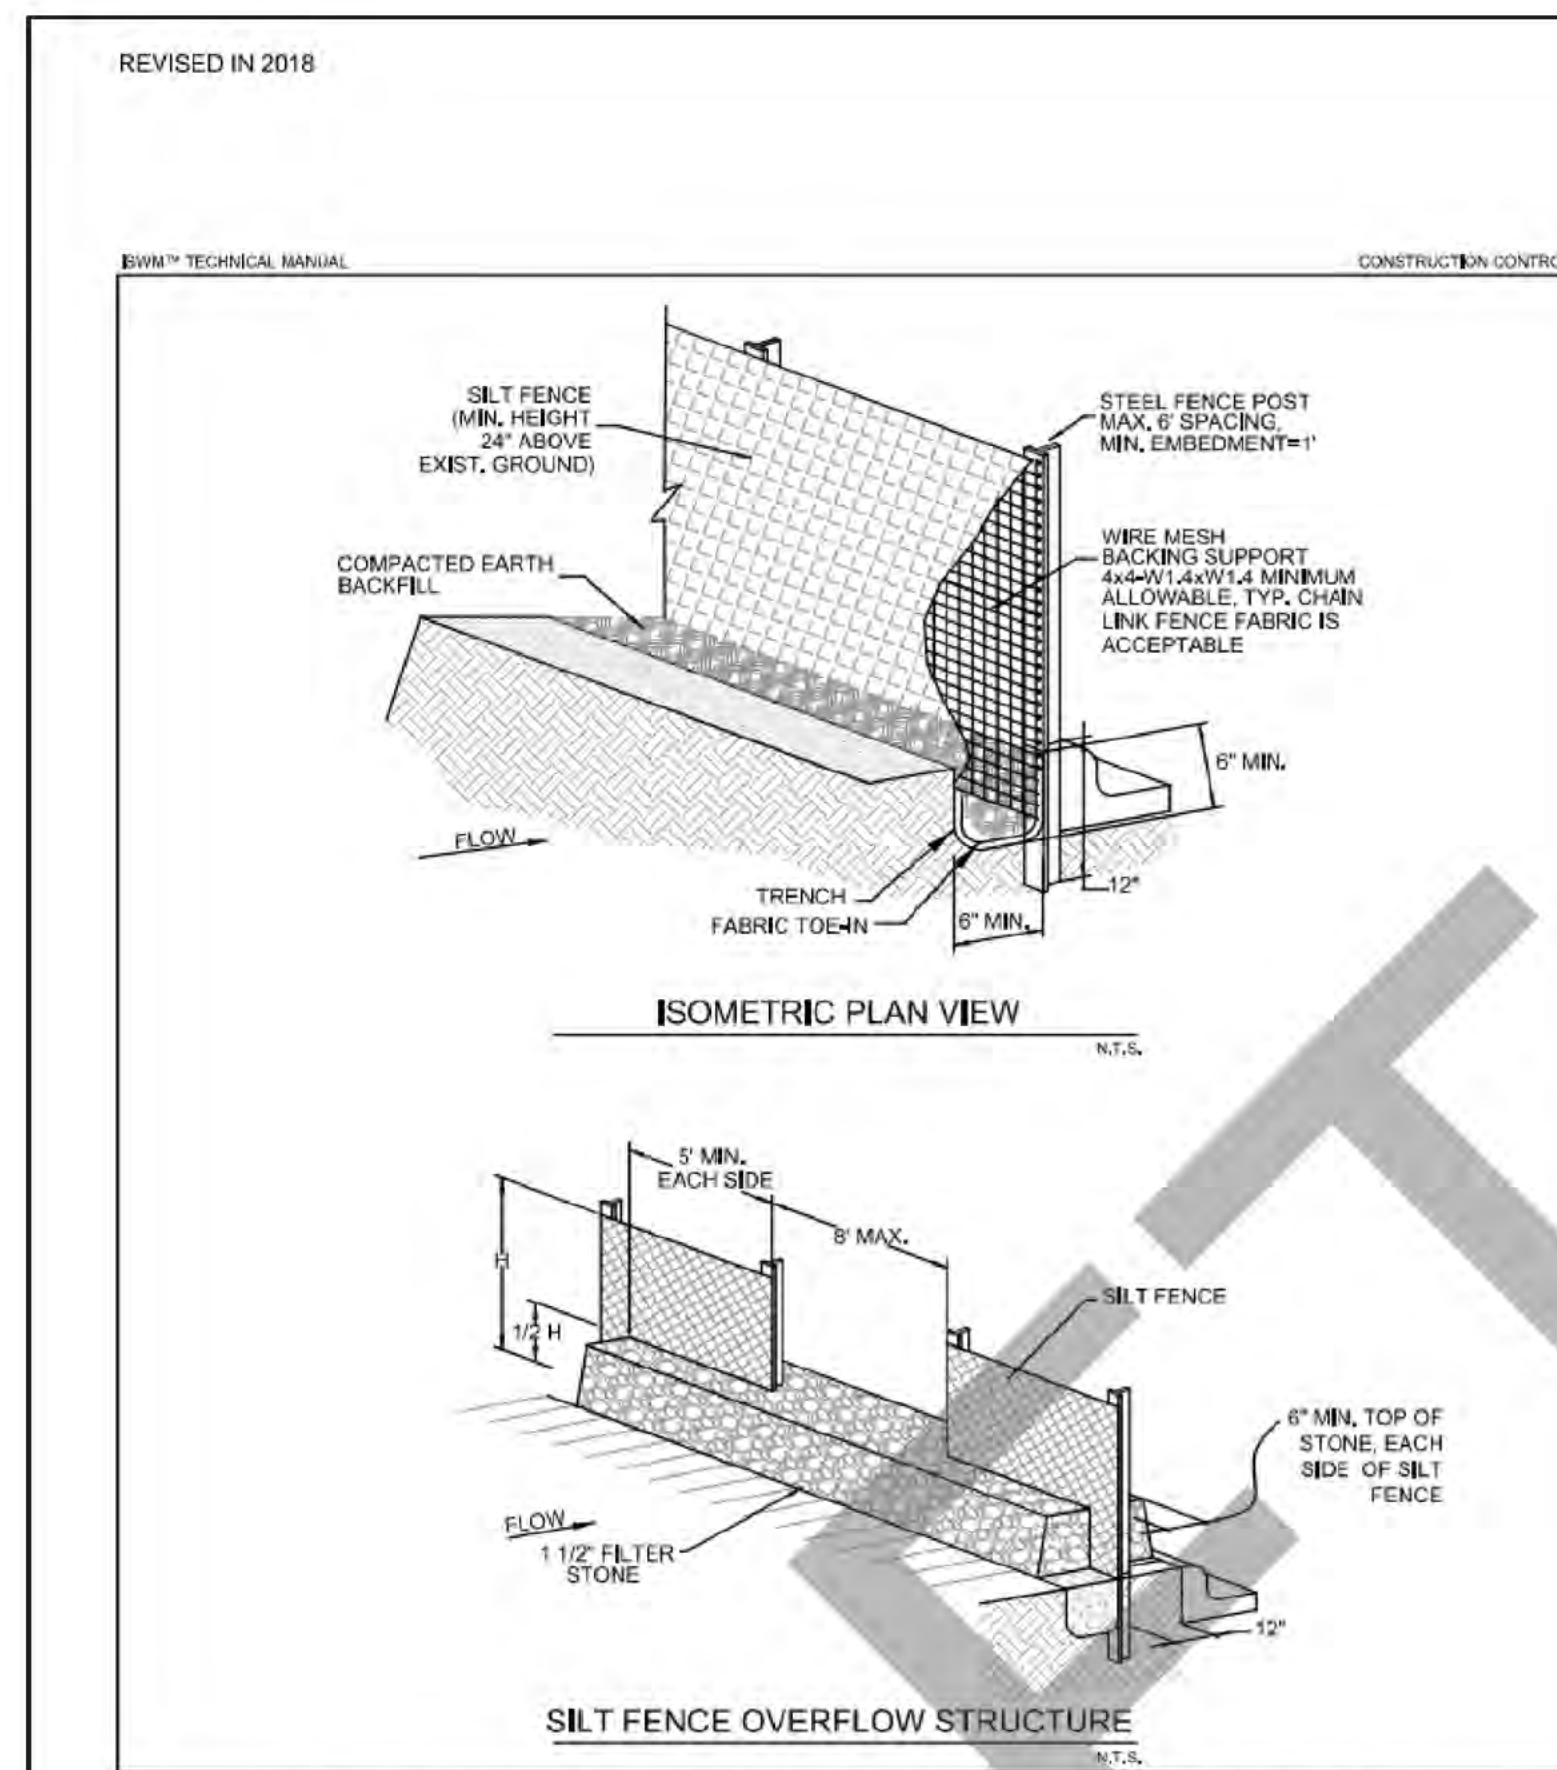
STANDARD CONSTRUCTION DETAIL - FOR SILT FENCE (1 OF 2)
